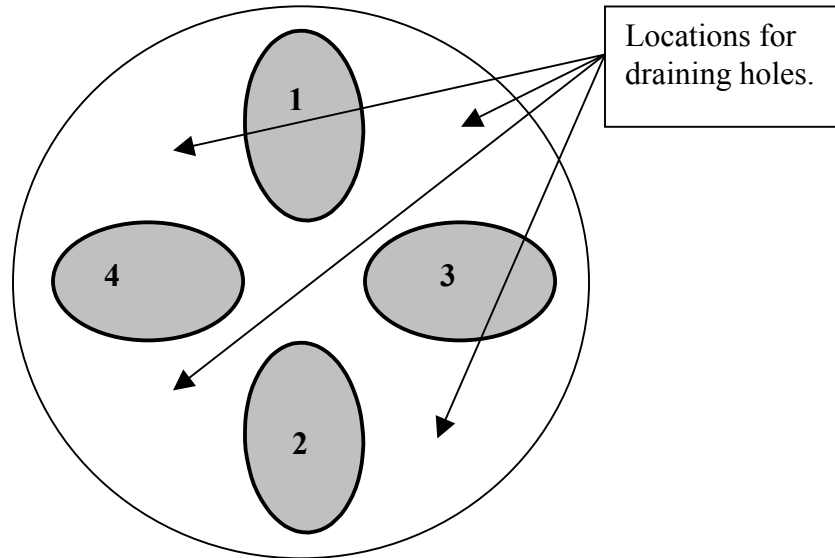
Draining holes locations around beams 1-4 intersection with the window.
